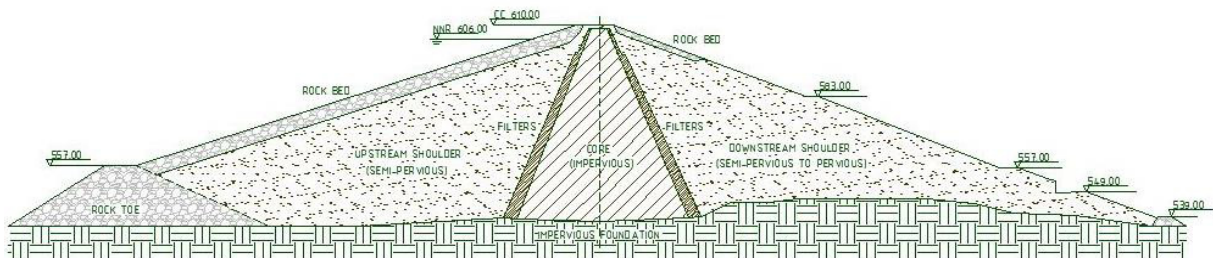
Maneciu Dam Section AMC3 (Profile 9) [3]
